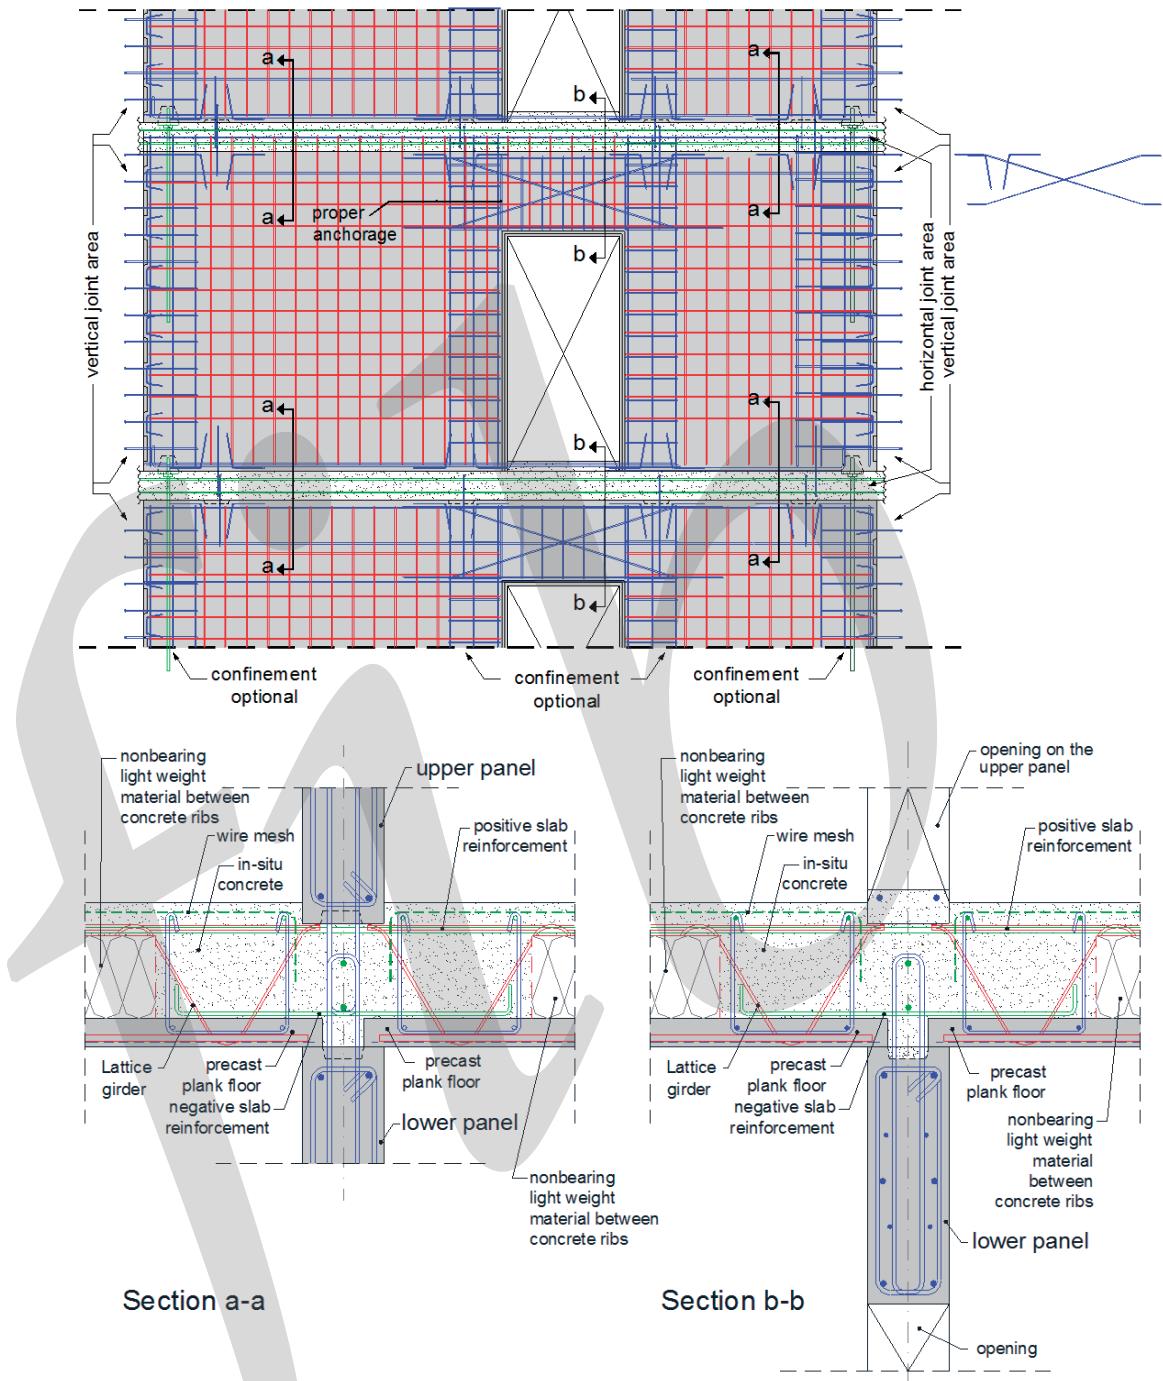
Detailing of wall composed of precast panels, with vertically stacked openings, connected together by means of vertical and horizontal joints
